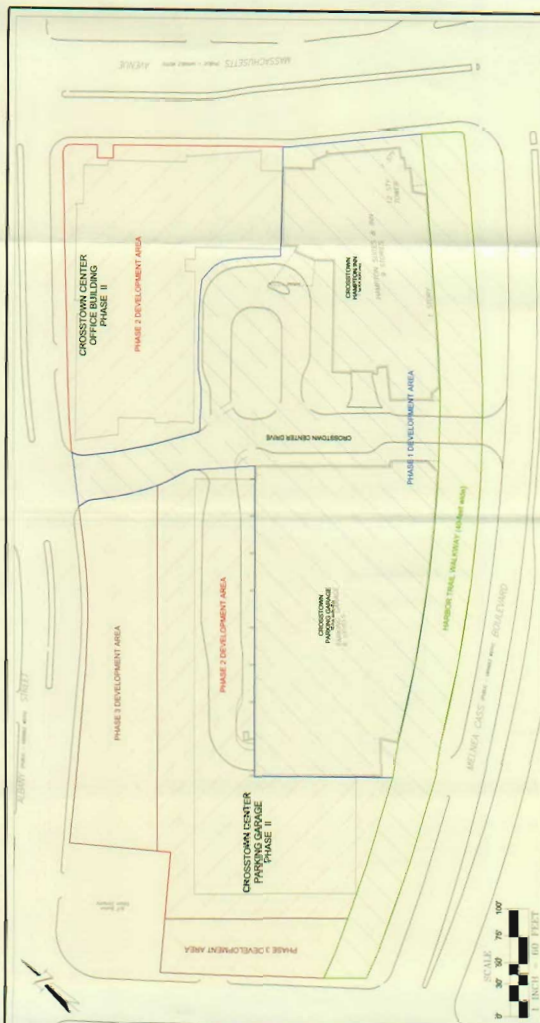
CROSTOWN PROPOSED AND EXISTING DEVELOPMENT PLAN
